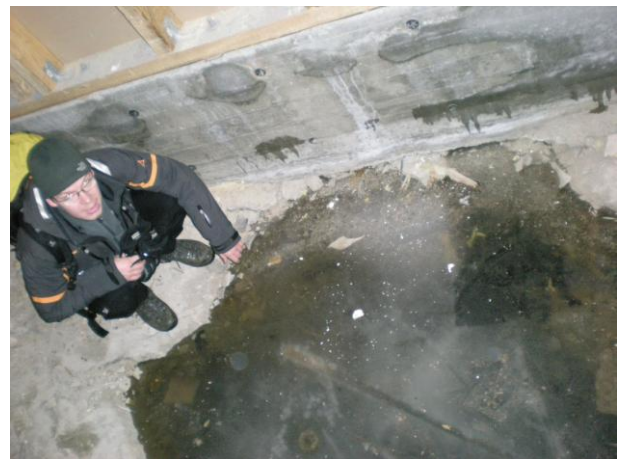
A lake of (frozen) water standing in the basement of a new building.
